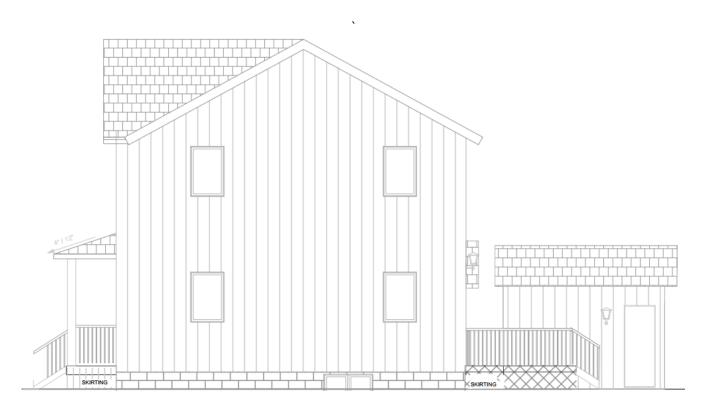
Proposed North Elevation, 40 Peter Street South. (*Image from client.*)
